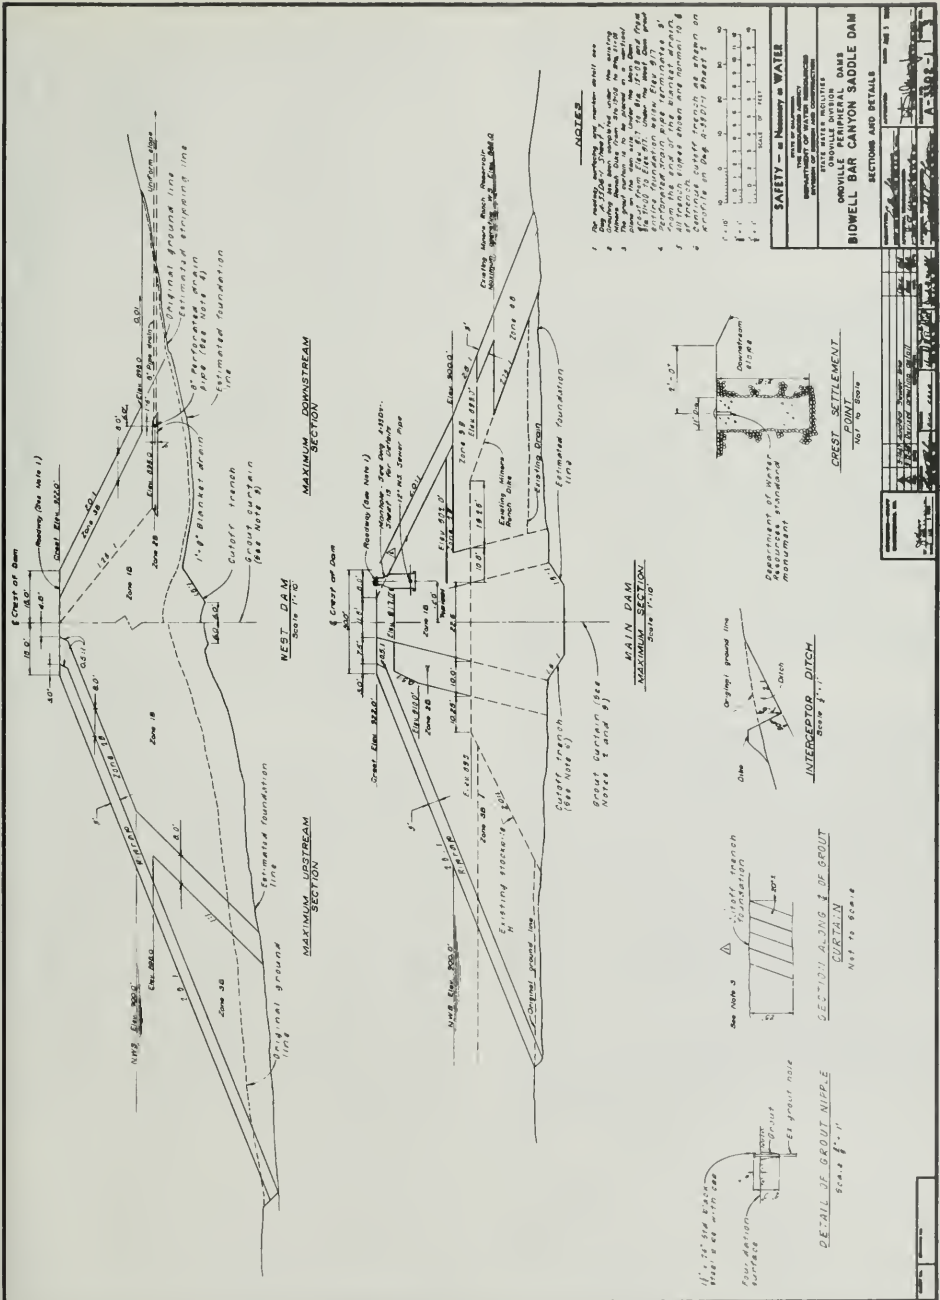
Bidwell Canyon Saddle Dam—Sections and Details
